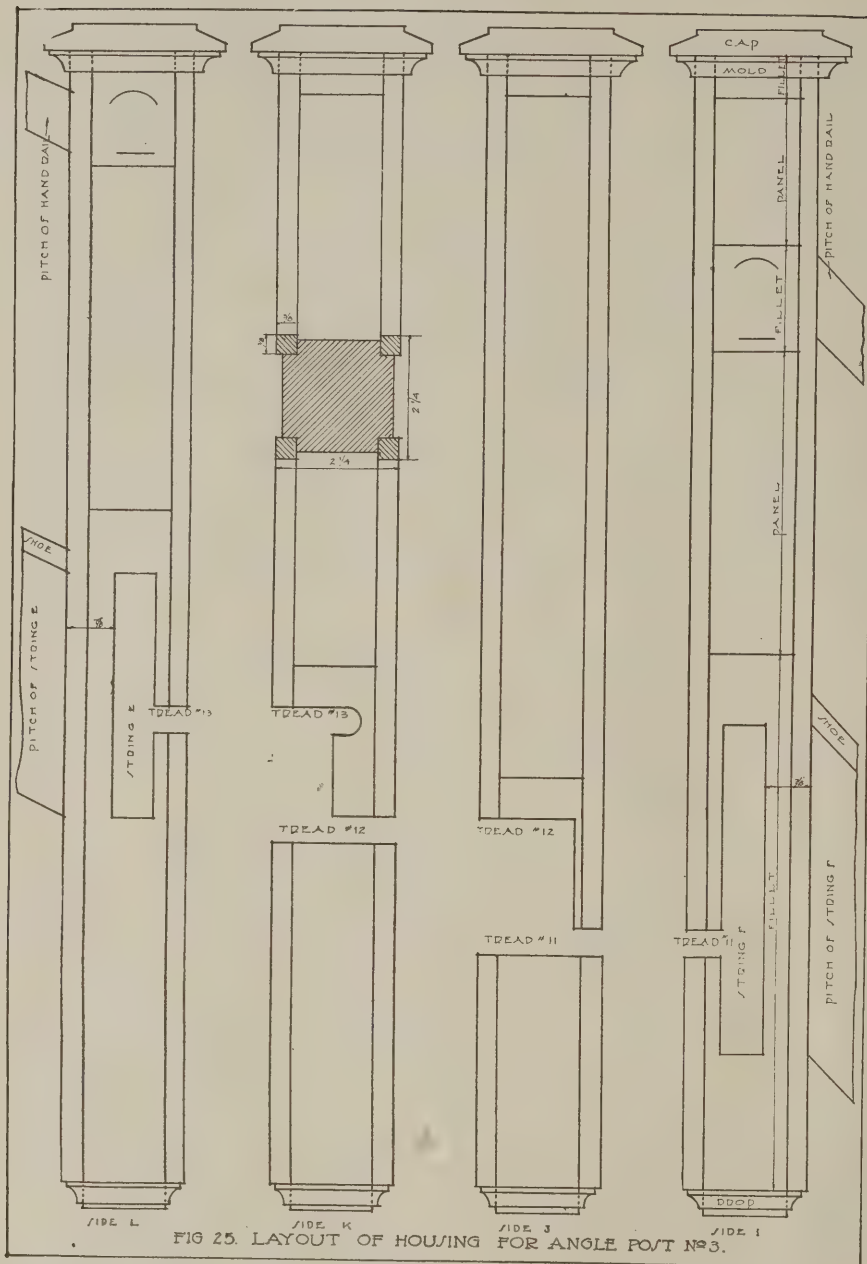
LAYOUT OF HOUSING FOR ANGLE POST NO. 3.
